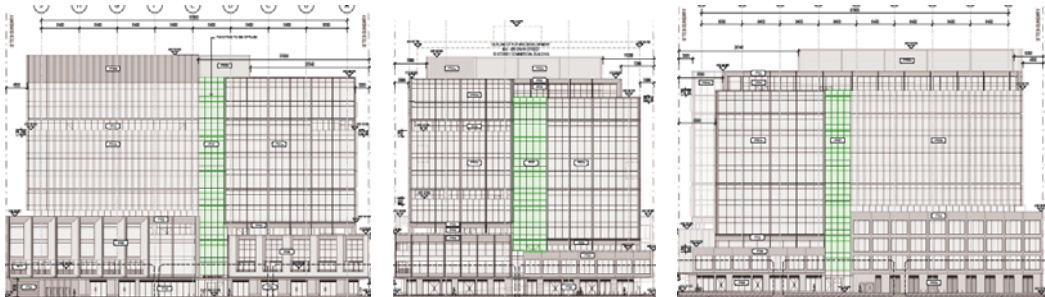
Extracts from the landscape concept plan, highlighting the indented setback between podium forms, where ‘vertical gardens’ are proposed on the northern, western and southern facades
